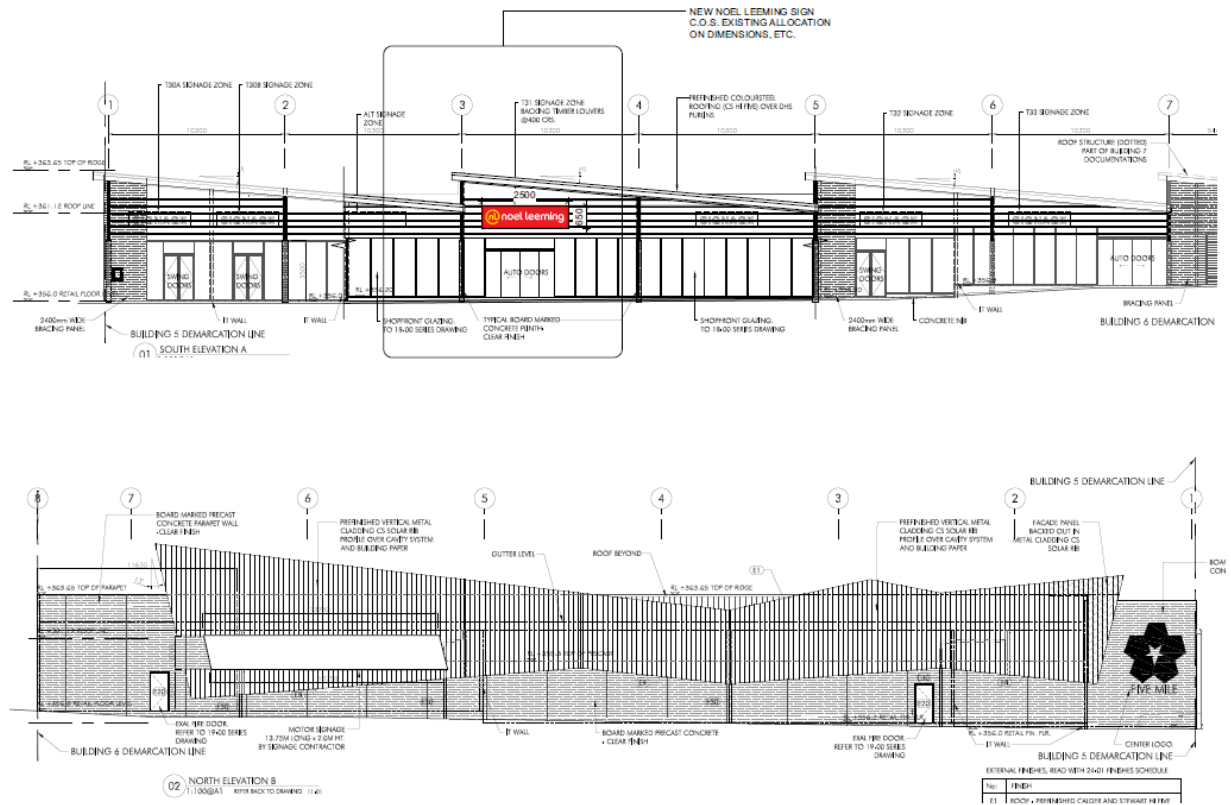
Figure D – Elevations of Building 6 at “5 Mile” in Frankton
